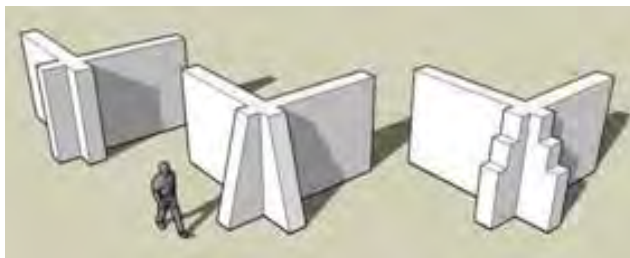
Corner Reinforcement Using Buttresses (Hart, K. & Geiger O. (n.d.)).
